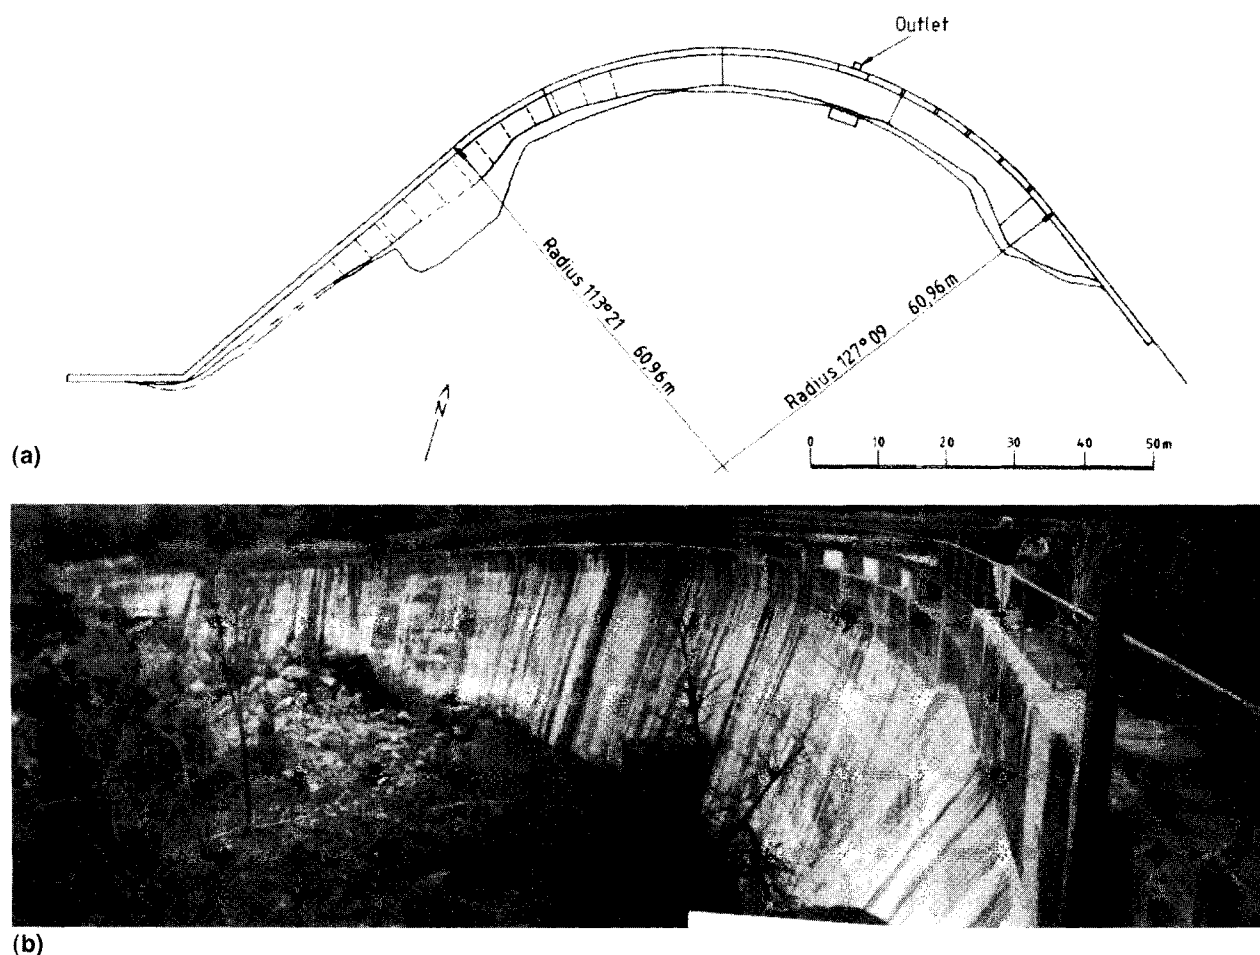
Quipolly Dam (1932): (a) Elevation in Plan, from Original Drawing; (b) View from Left Bank Showing Outlet System at Bottom of Downstream Wall (1997 Photograph)
